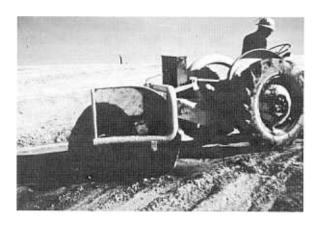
Placing and rolling second lift-Merritt Dam upstream slope modification, Photo P719-701-7
